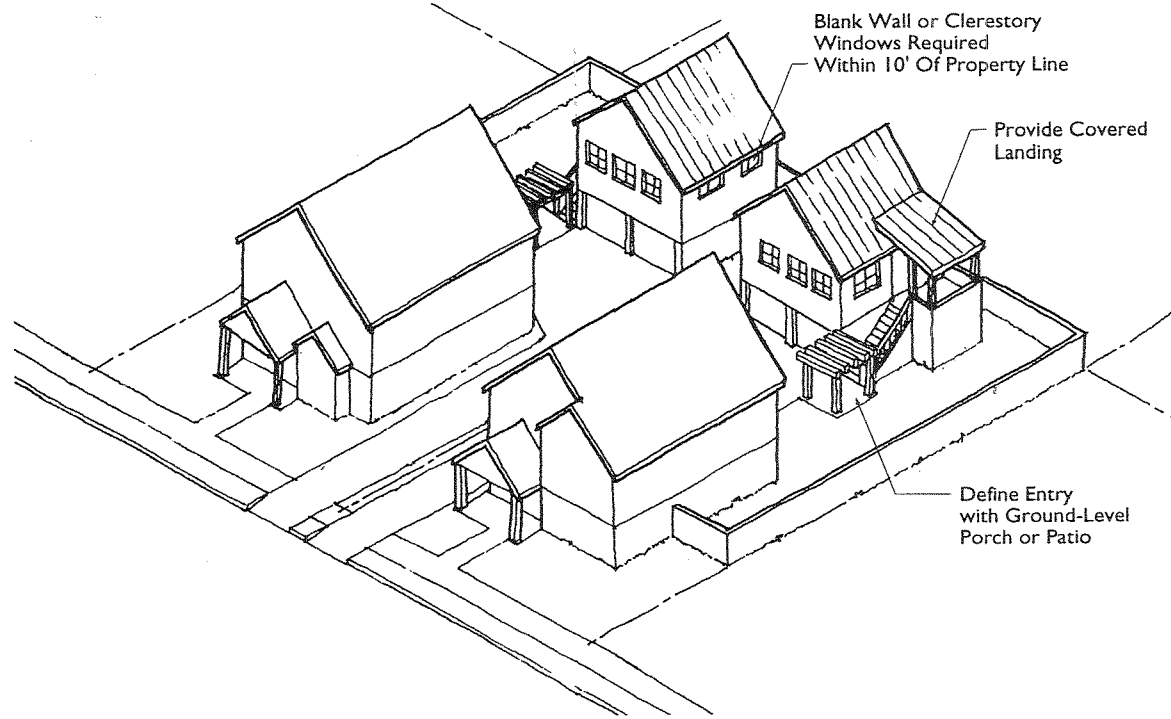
, Accessory Dwelling Unit. Accessory dwelling units should be located above a detached garage at the rear of the residential lot.
